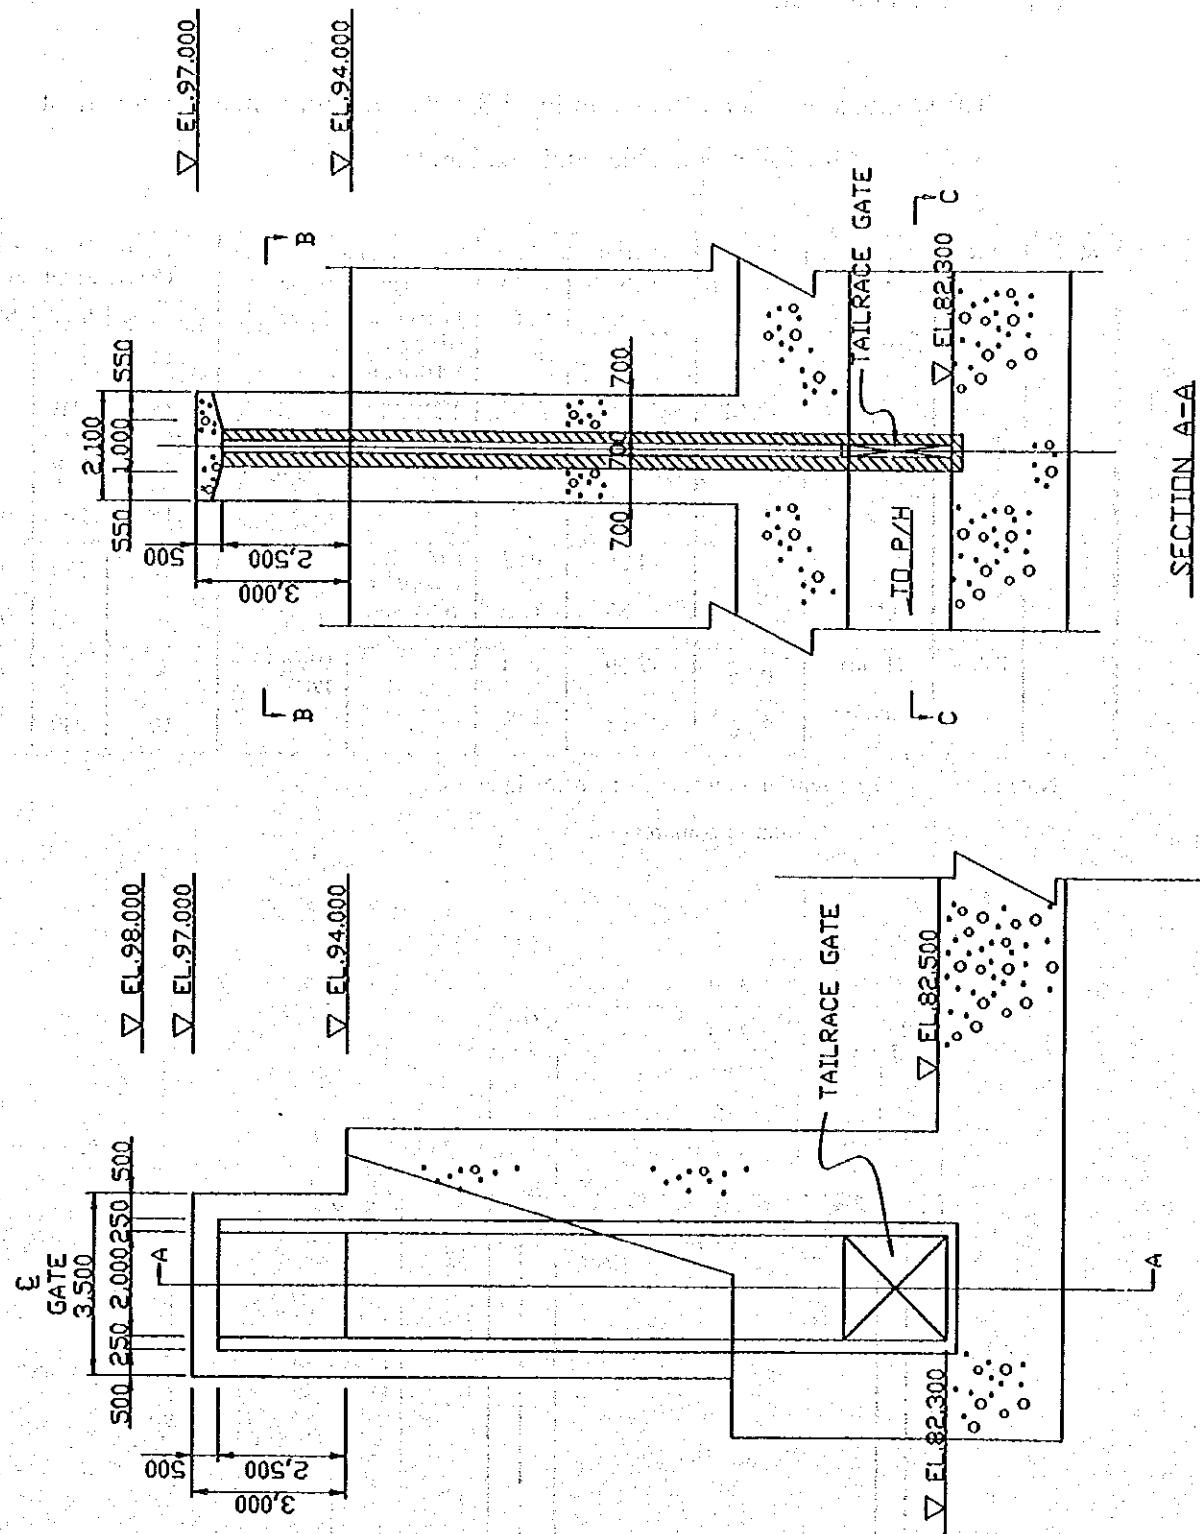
Profile and Section of Tailrace Gate Tower
